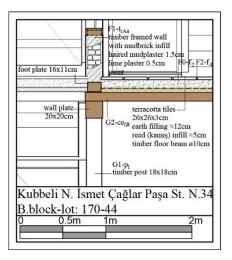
Connection detail 4, section drawing of floor beams located on the wall plate of lower floor wall and foot plate of timber framed wall on floor beams (Kılıç N. b. block-lot: 170-44)
